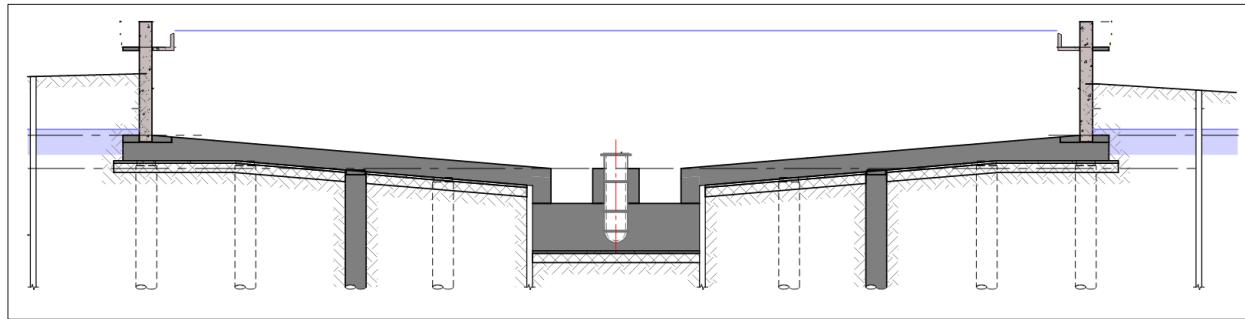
Clarifier cross section showing the internal sloped concrete floor and central sludge well.
